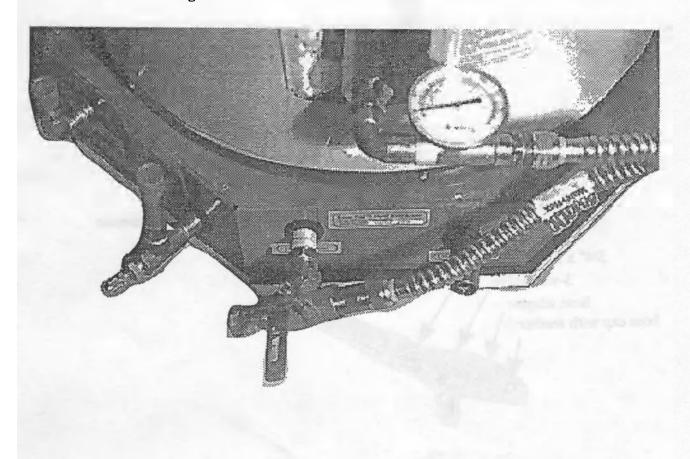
Parts laid out for the cold water hook-up between the solar storage tank and the heat exchanger.
